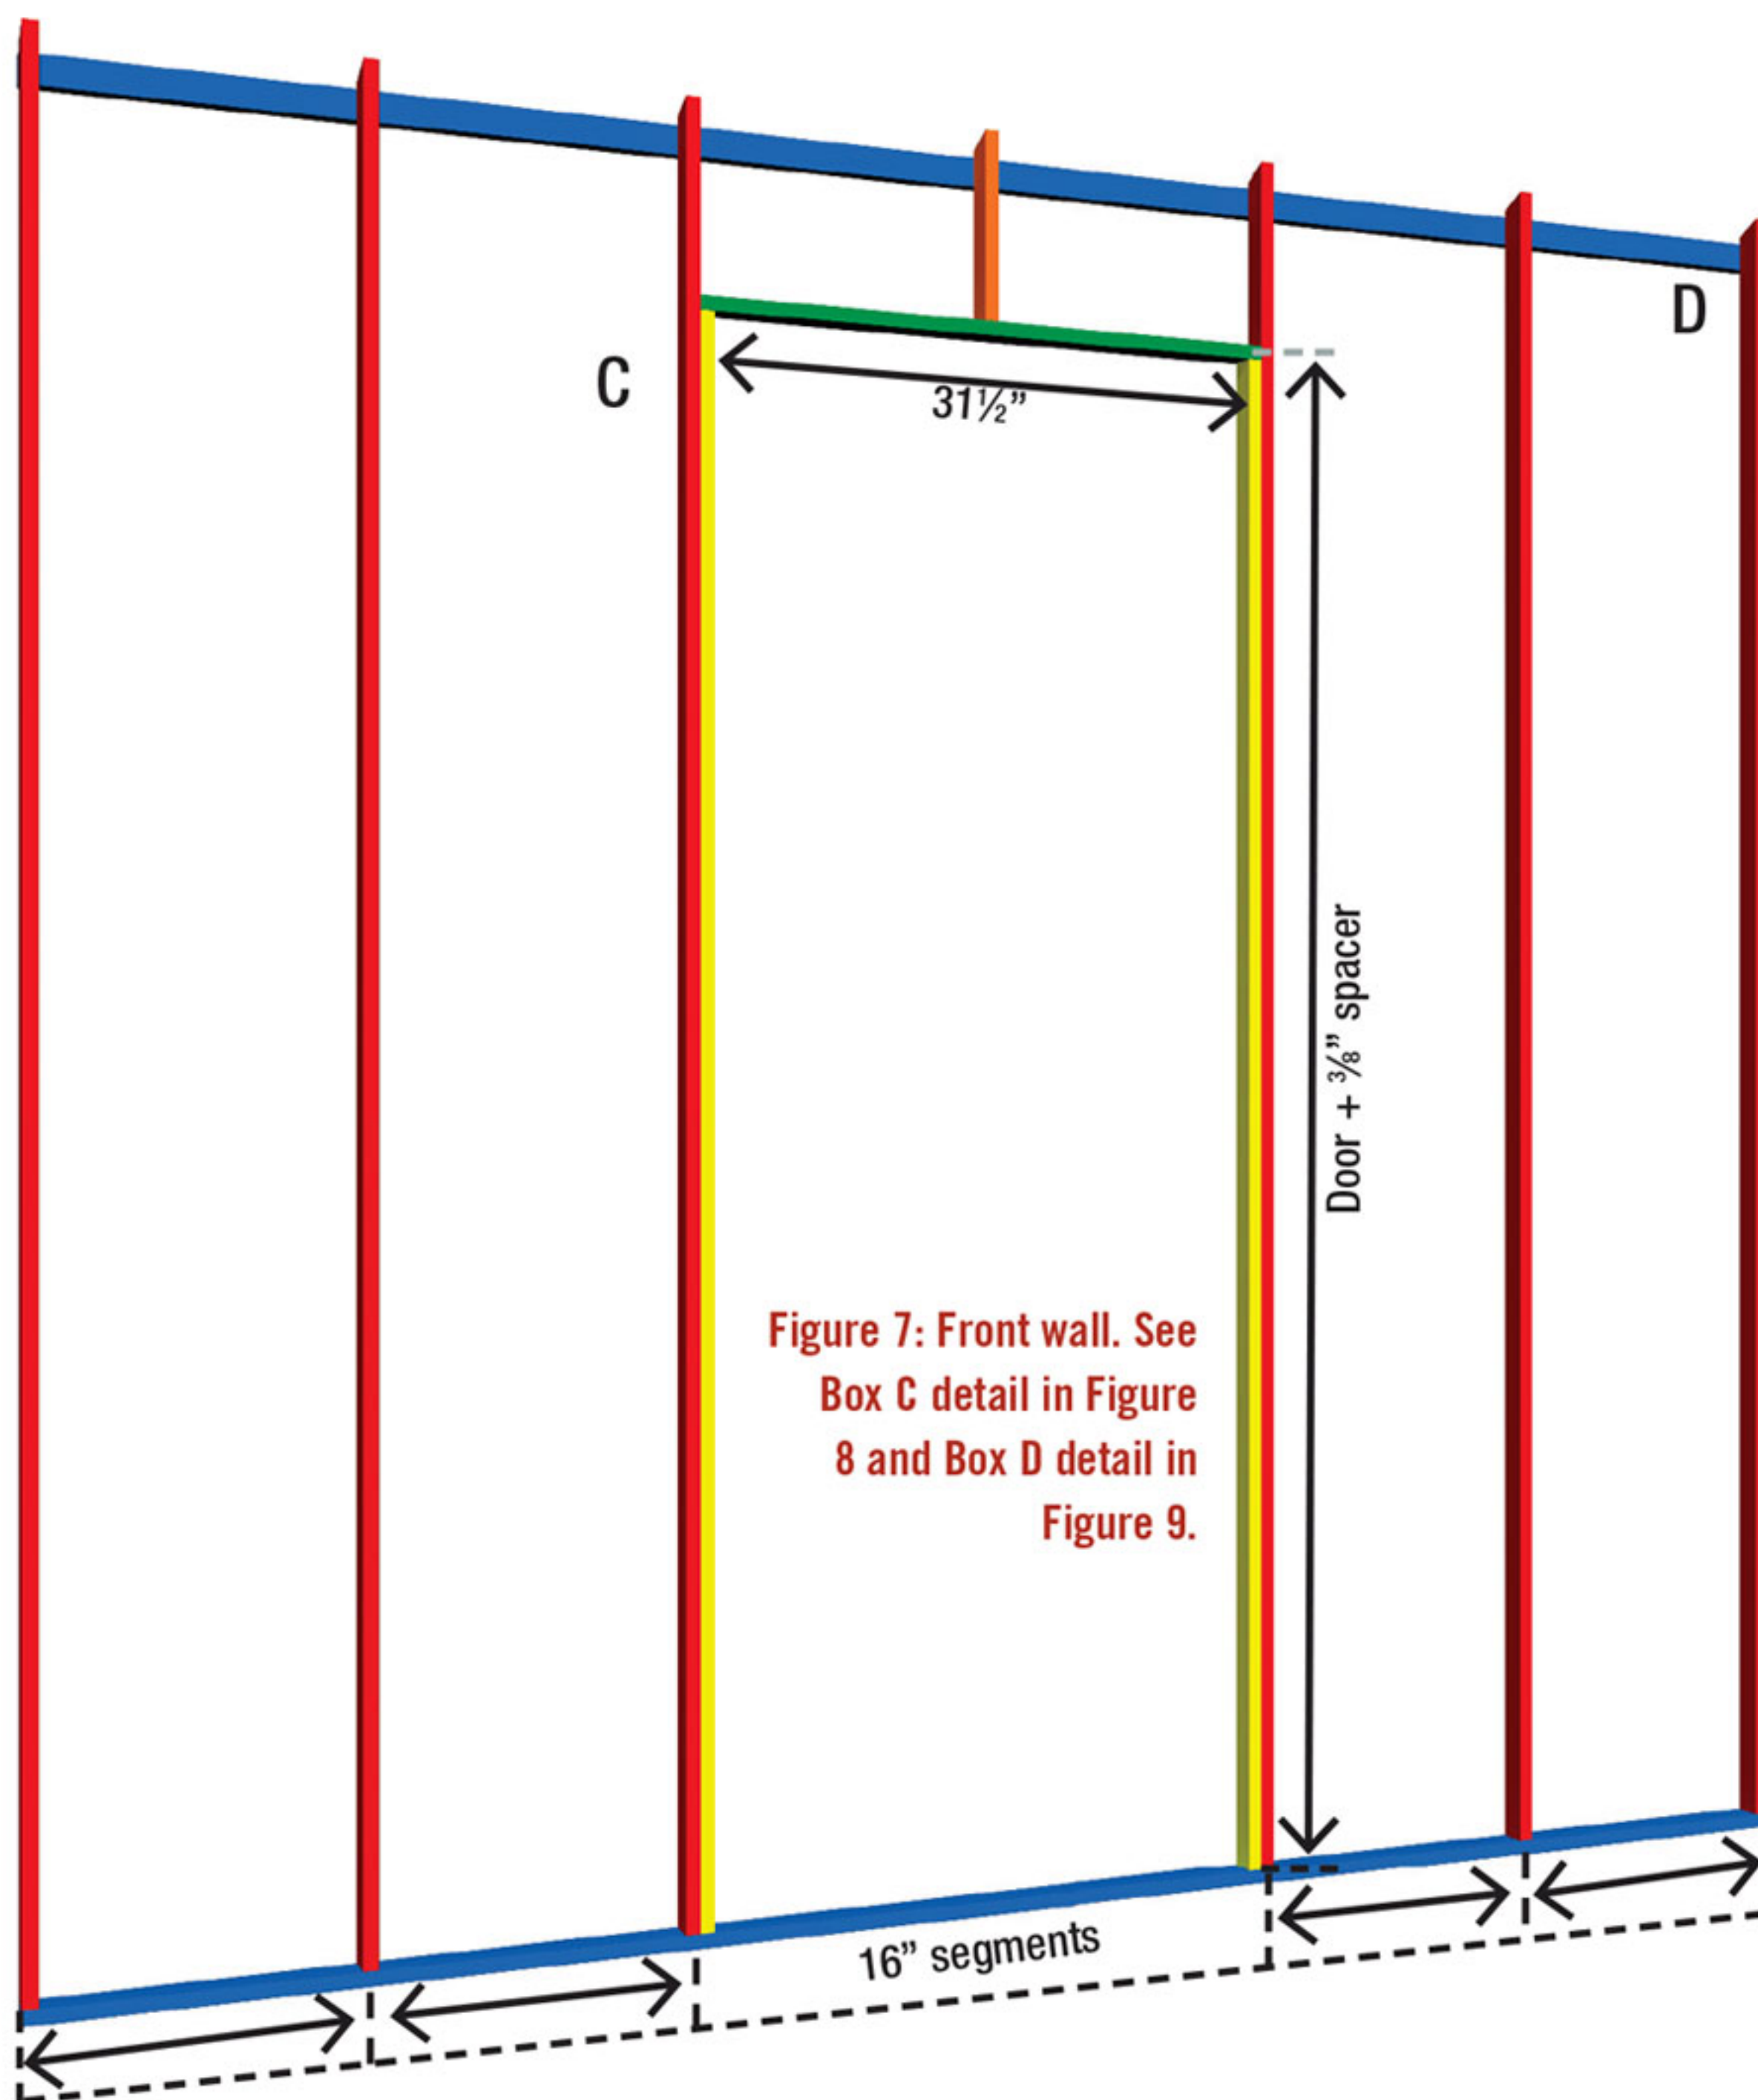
Front wall. See Box C detail in Figure 8 and Box D detail in Figure 9.
